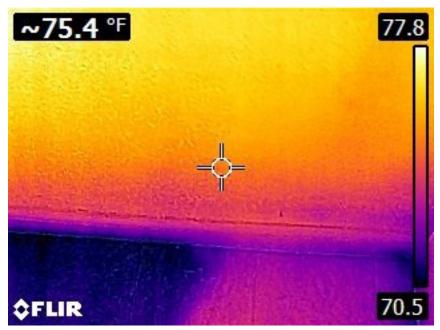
Here upstairs in bathroom cabinet the drywall was moist and damp
